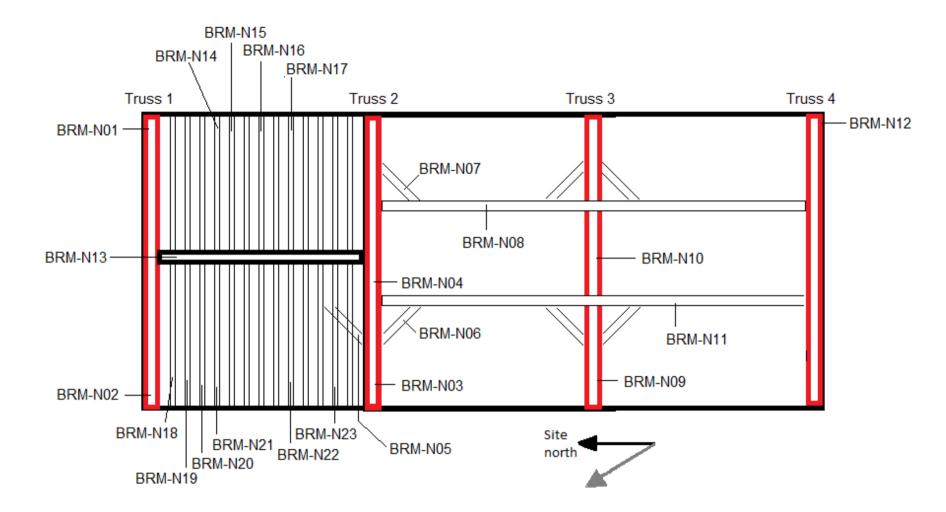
Sketch plan of the barn showing the approximate position of sampled timbers BRM-N01-23
